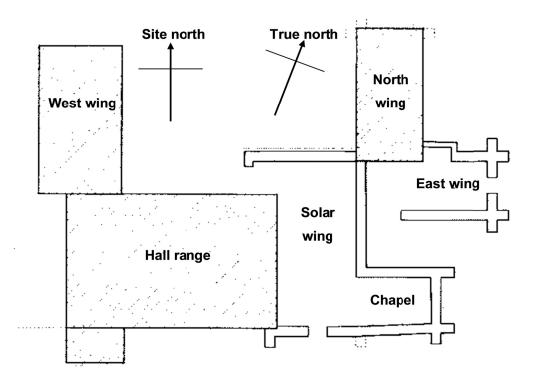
Plan to show arrangement and location of the Kilve Chantry buildings (afterJones 2003)
